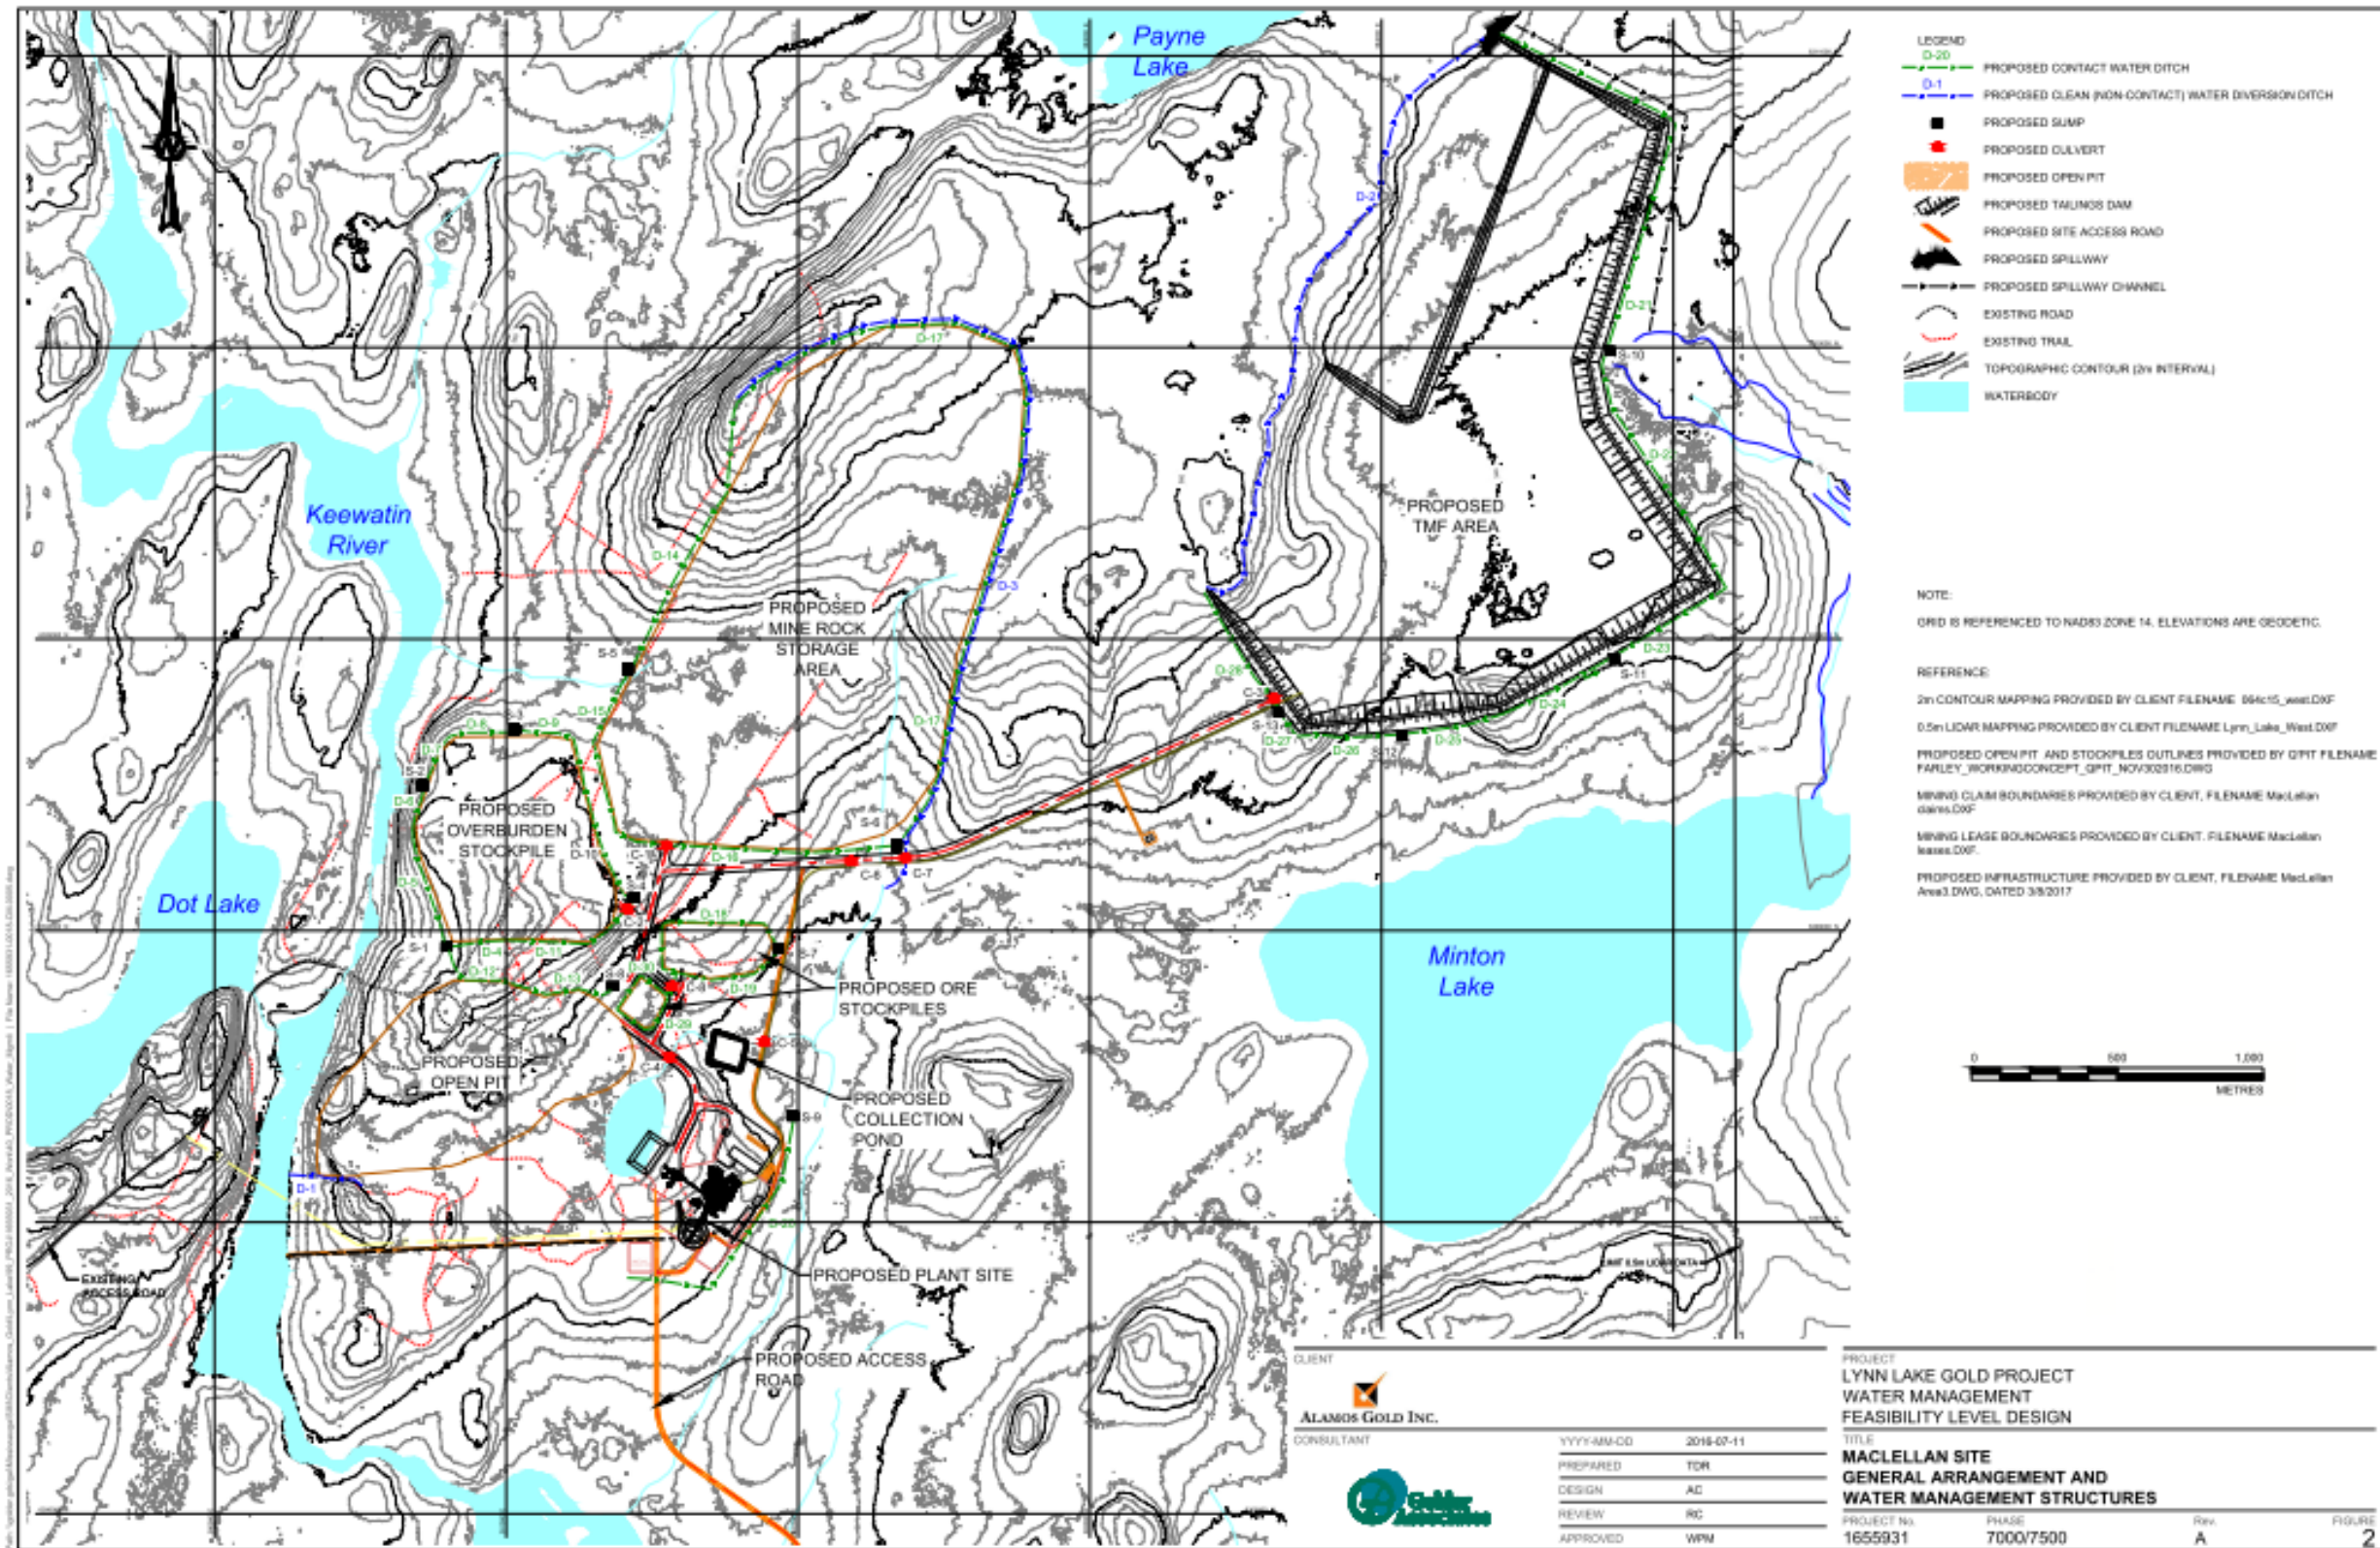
MacLellan Site General Arrangement and Water Management Infrastructure
